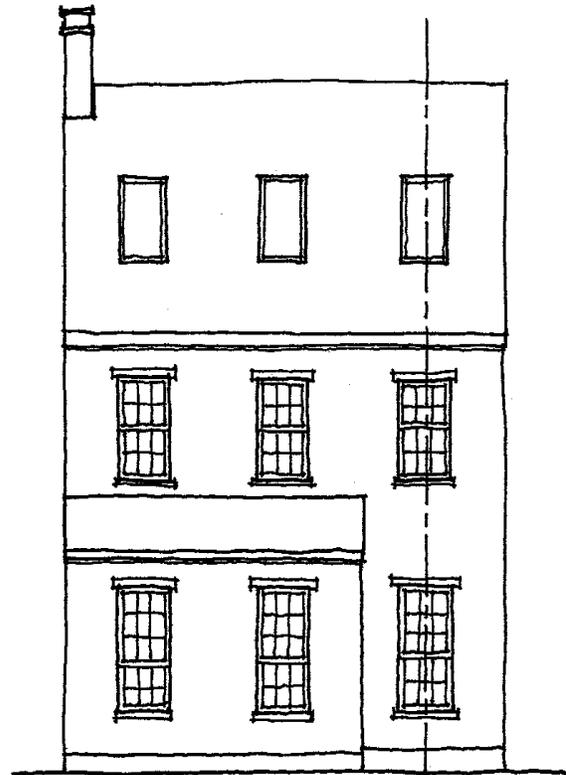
While skylights are not recommended on primary façades, they may be added to secondary façades if they are incorporated into the overall pattern of doors and windows. Skylights should align vertically with windows in the wall below.
